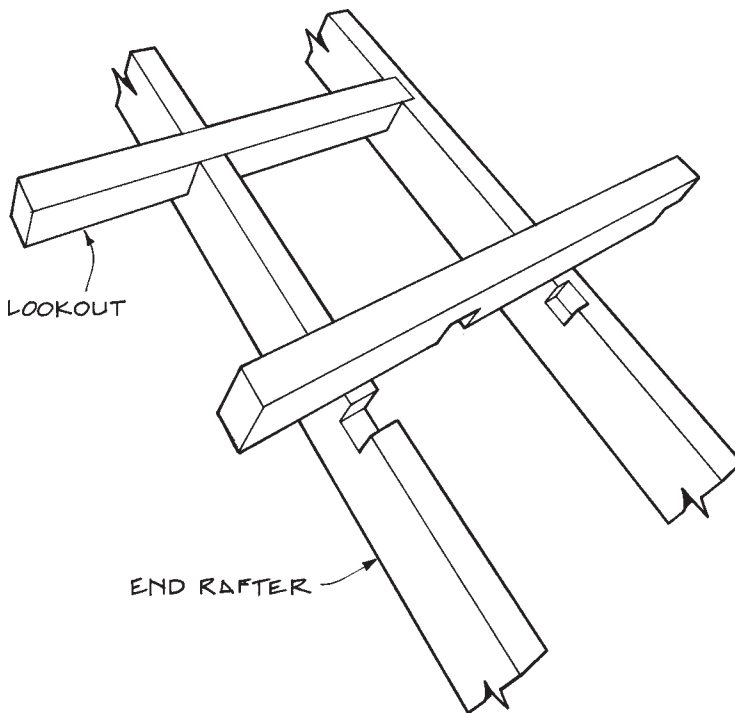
In common-rafter roofs where a substantial rake overhang is required, "lookouts" are framed to cantilever out.
